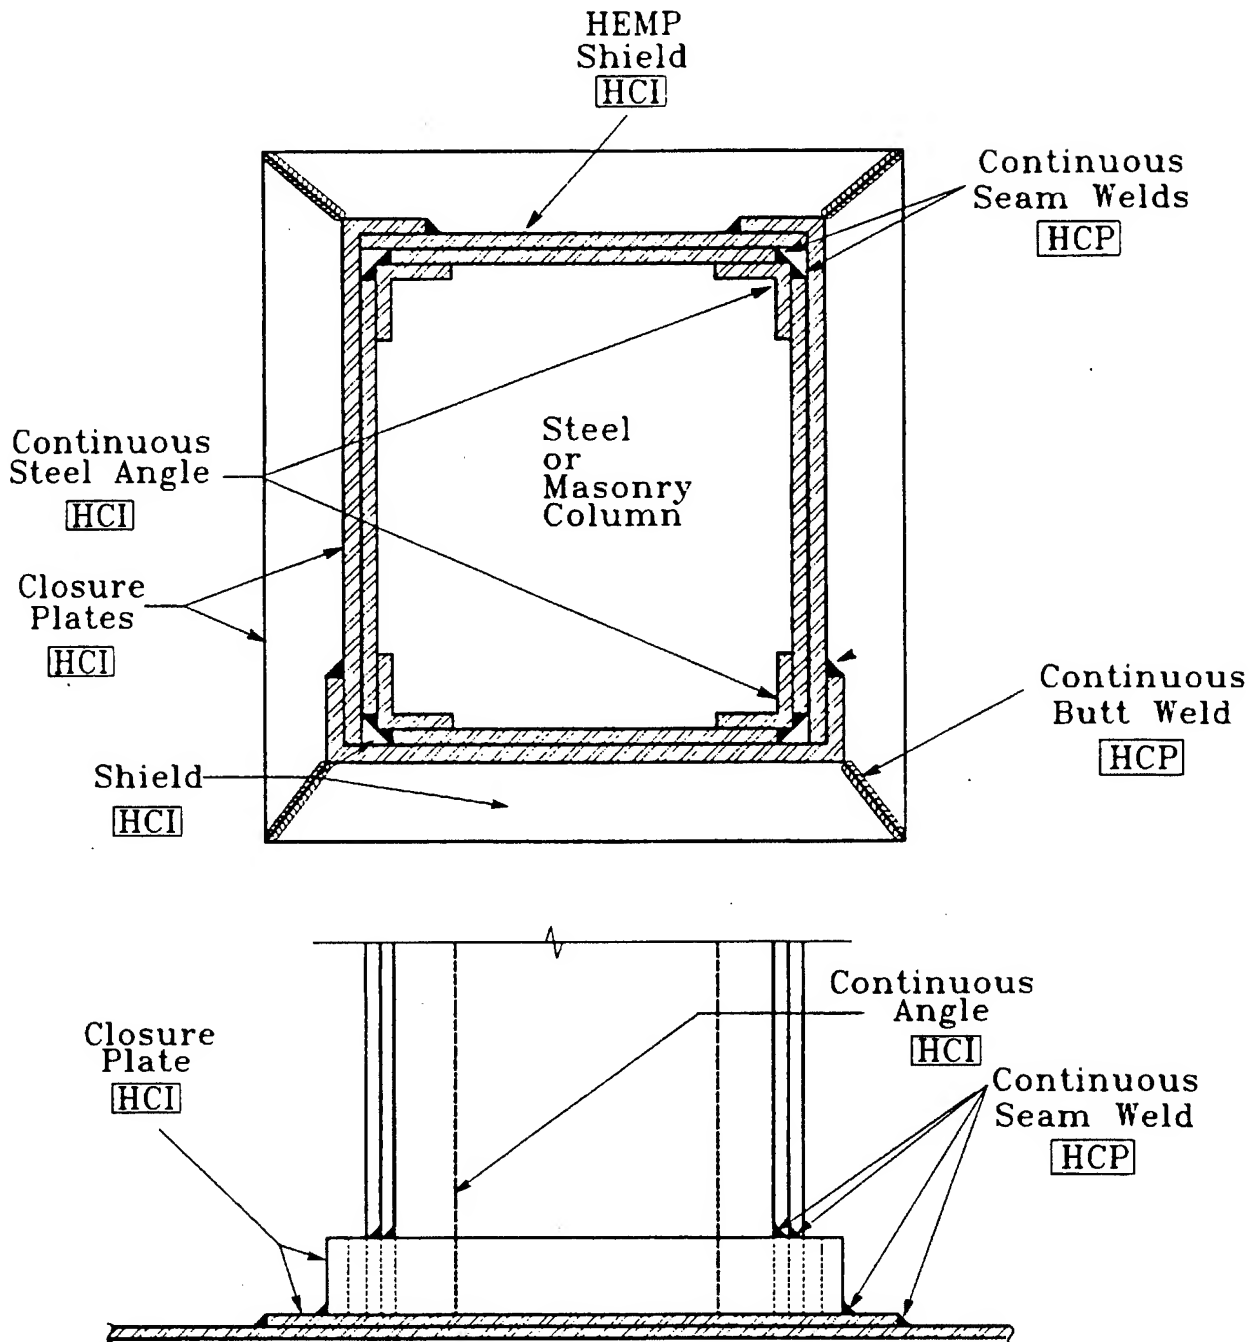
Plan and elevation drawings of a column shield assembly.
